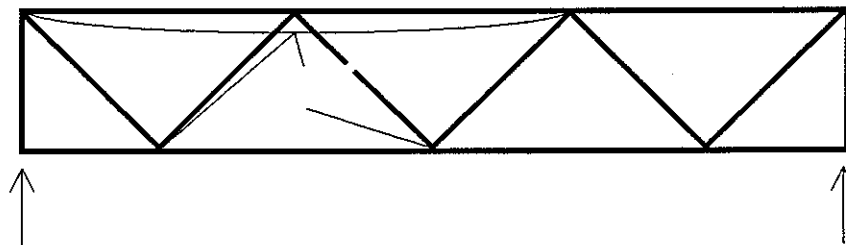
Standard truss showing deflected shape after the web is cut. This truss will still carry substantial loads.
